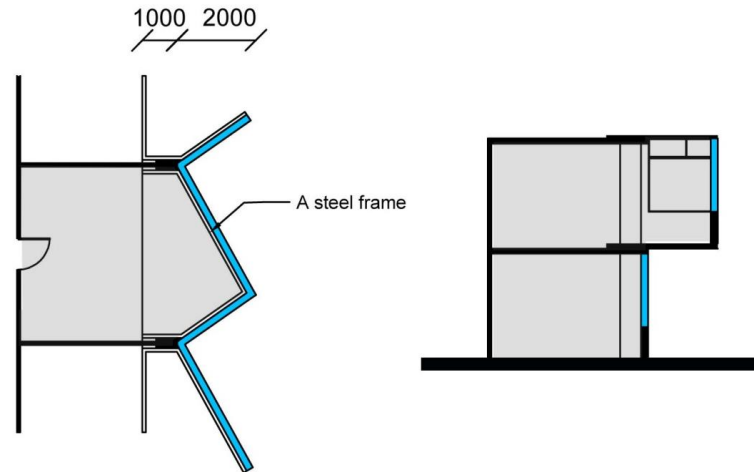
Diagrams that show the way a multi-angled façade unit is connected to a building façade according to scenario 4
